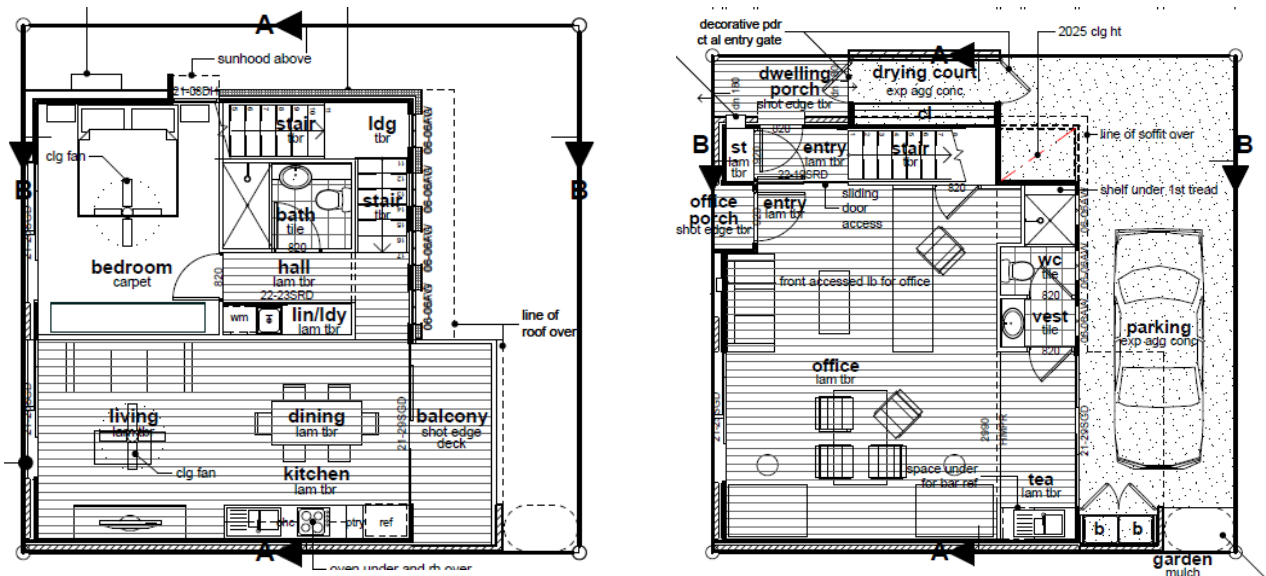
Floor plans of Soho built at Fitzgibbon Chase, Brisbane
